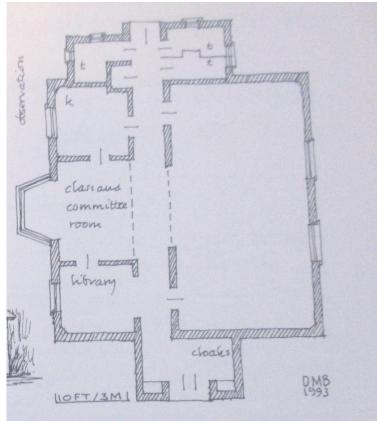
Ground floor plan of the meeting house prior to extension, as reconstructed by Butler (north is to the right: not to scale) (Butler (1999), vol. II, p.719)
